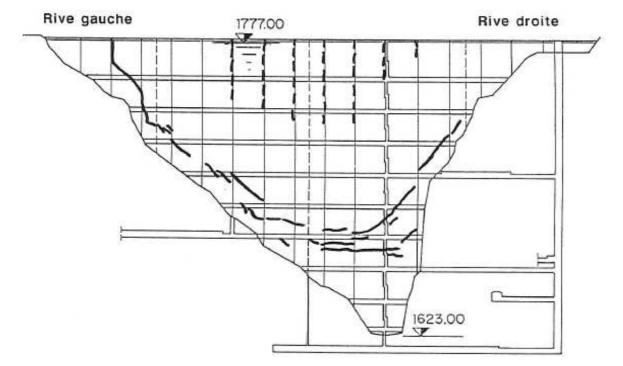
Crack pattern in Zeuzier arch dam caused by non-uniform foundation movements of a few centimetres (solid line: cracks at downstream face; dotted line: cracks at upstream face) (Amberg and Lombardi, 1982)
